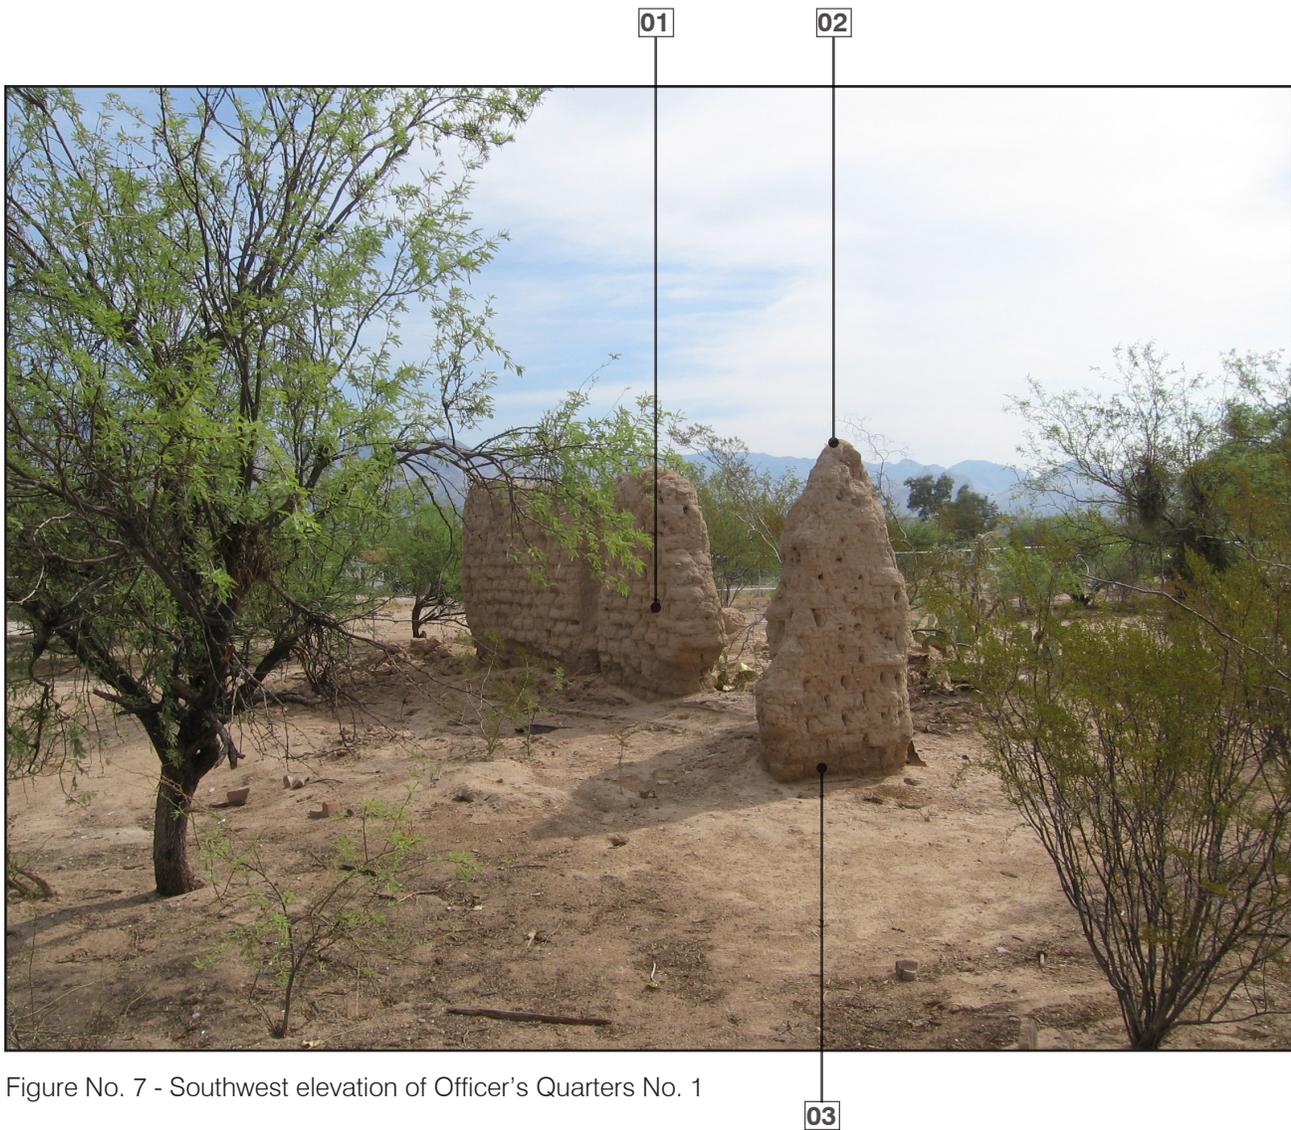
Southwest elevation of Officer's Quarters No. 1
